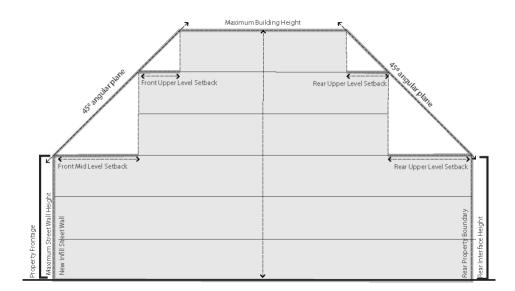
Building envelope requirement – Infill Building (Figure 2 in Schedule 15 to Clause 43.02 Design and Development Overlay).
